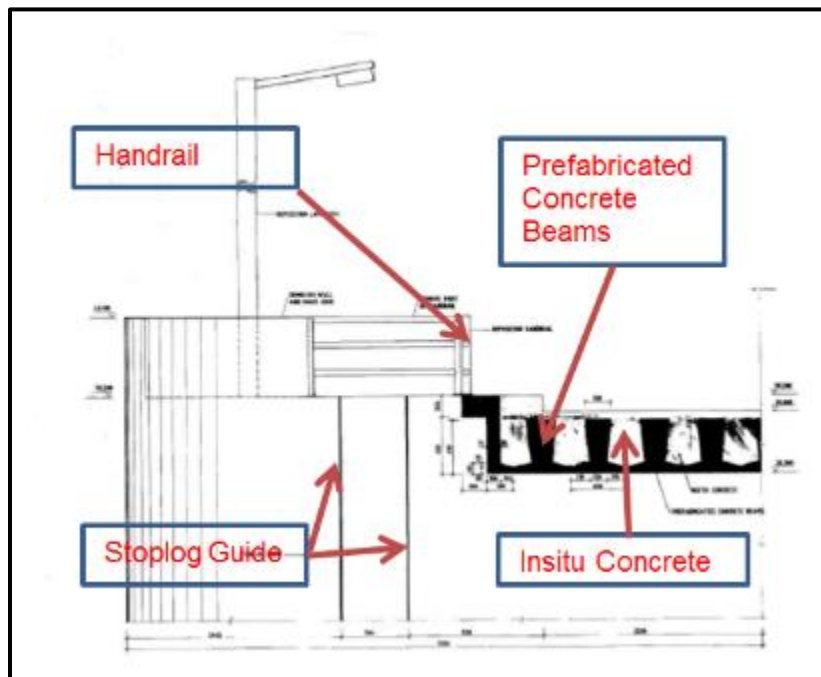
Typical Section through Main Spillway Showing Deck Slab (Denys, 2013)
